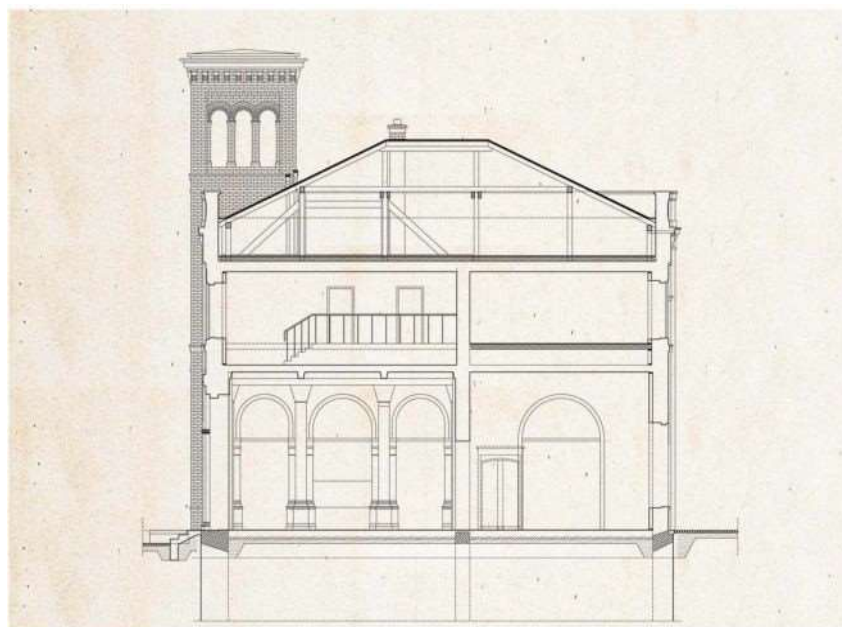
North-west elevation, drawing DOMUS, author, 2011, [9]
